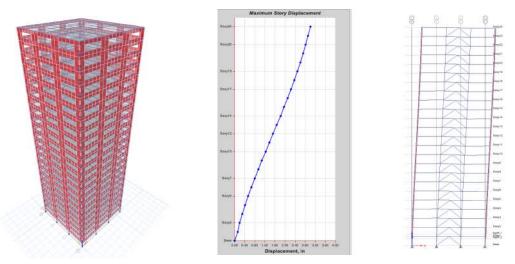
Case 2, 24-story braced frame with steel plate structural cladding. 3-D view of ETABS model, wind drift graph and elevation diagram showing deflection under wind load. (HOK).
